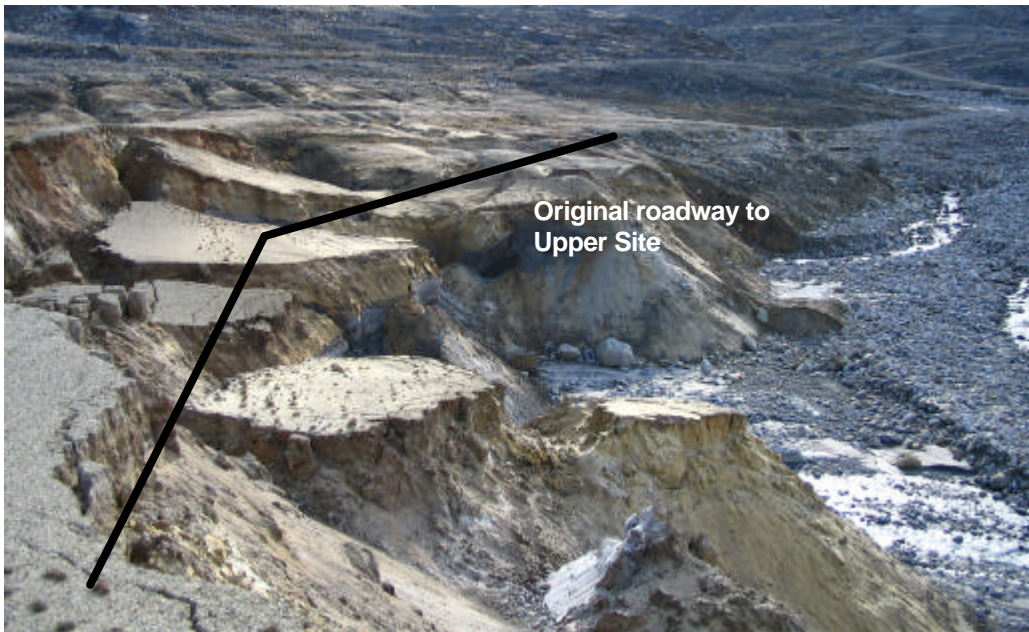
Road to Upper Site which is beyond repair resulting from glacial outwash and erosion of the sand.
